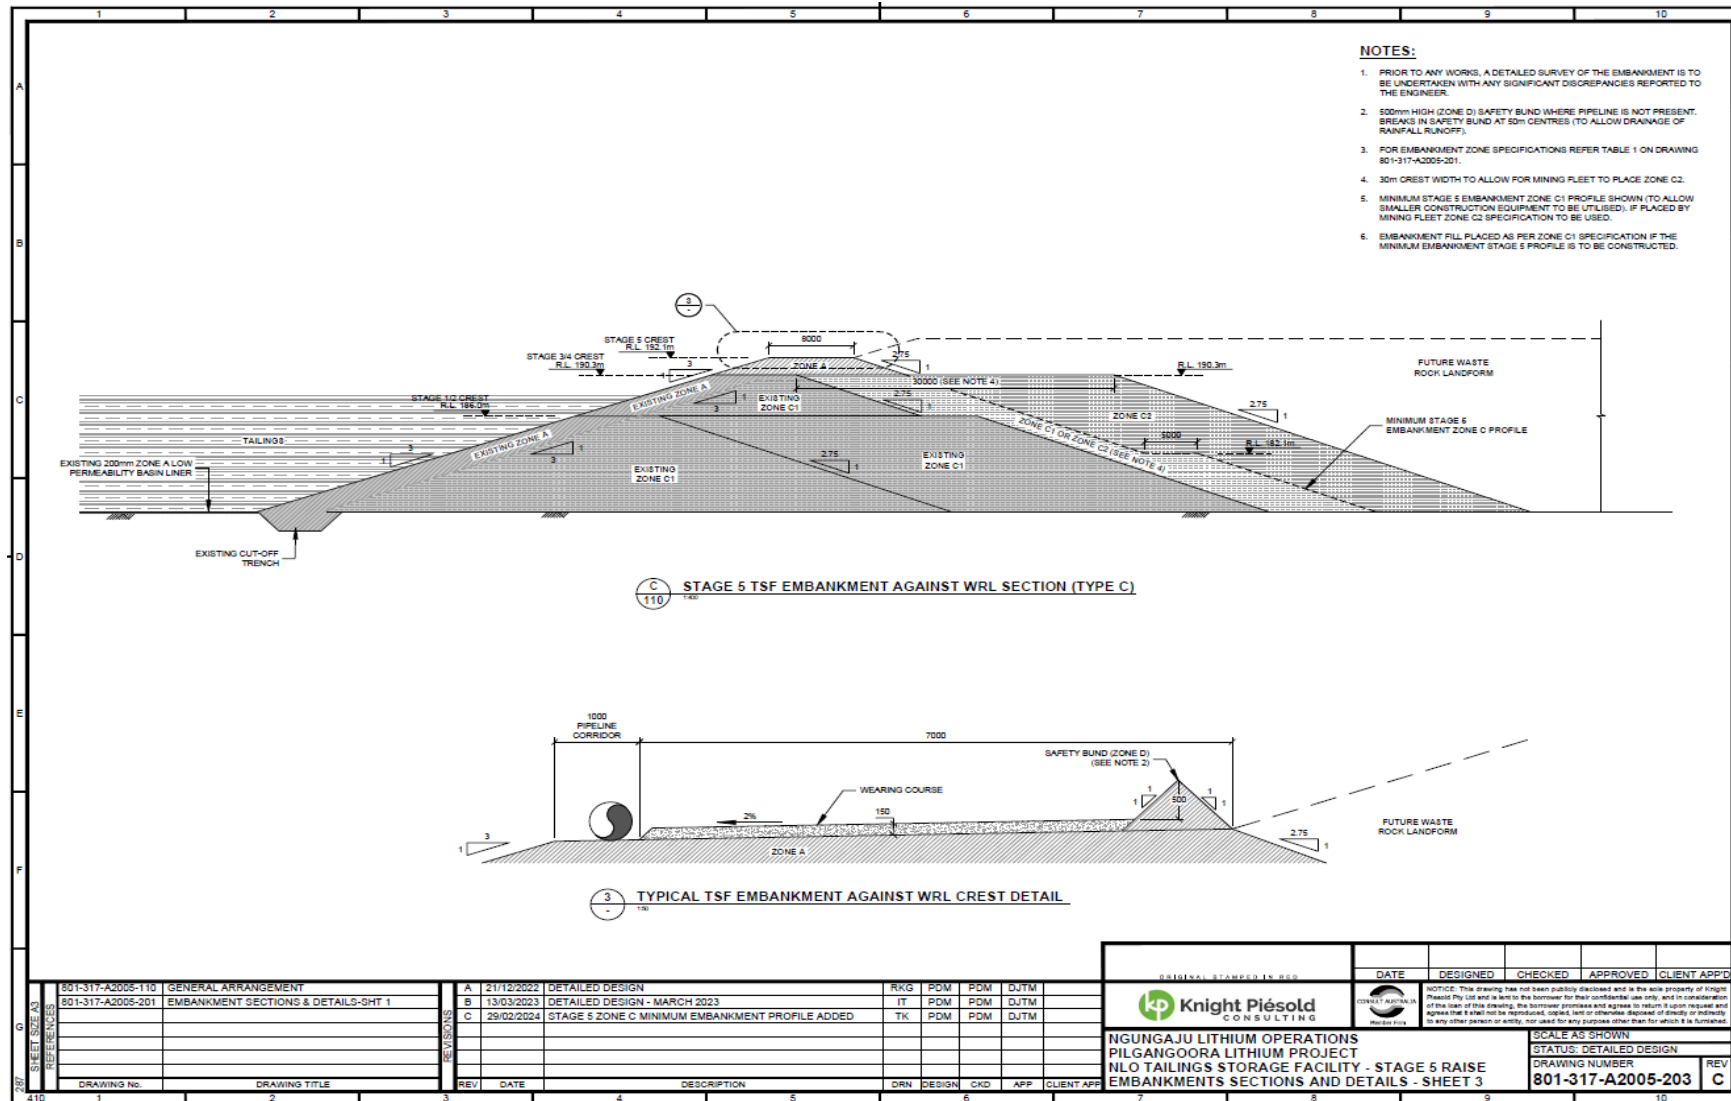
NLO TSF raise 5 embankment construction details – Type C
